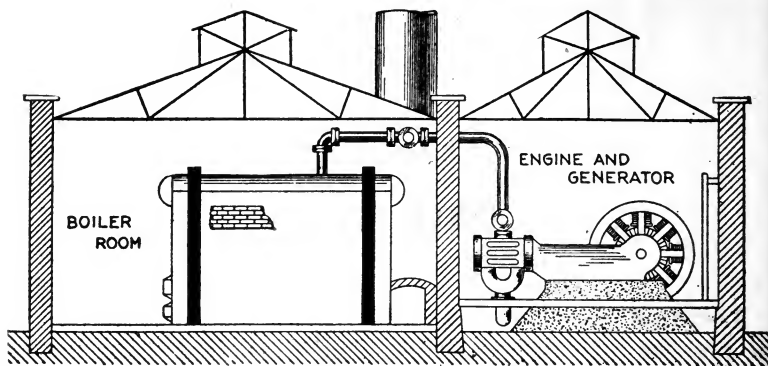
,119.—Location of engine and boiler. Ideal conditions for steam economy require that the steam pipe be as short and direct as possible, while for minimum wear, the engine should be in a separate room so its bearings and working parts will be protected from the ashes, coal, dust, etc., of the boiler room.
